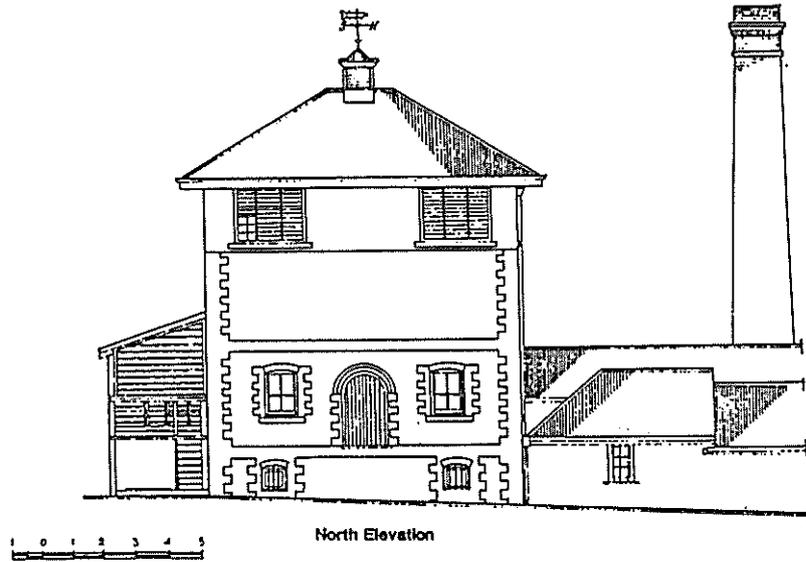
continued Plans, sections and elevations of brewing tower, Pike's Dorset Brewery, Oakbank
